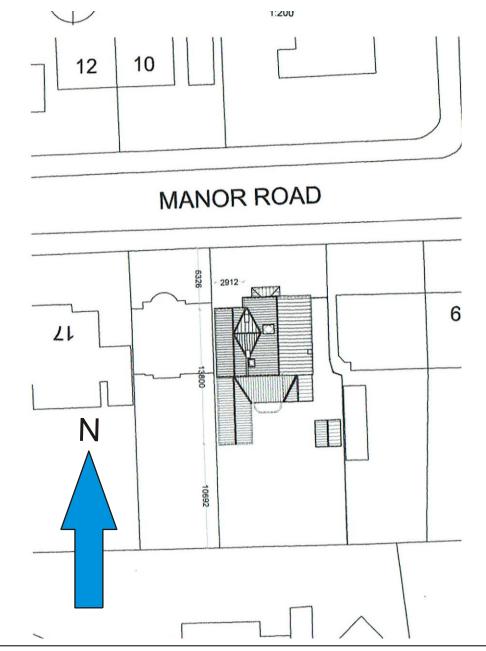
Block plan showing the proposed layout of the development site at 13, Manor Road at an original scale of 1:200, (not to scale), (extract from Architects plan).
